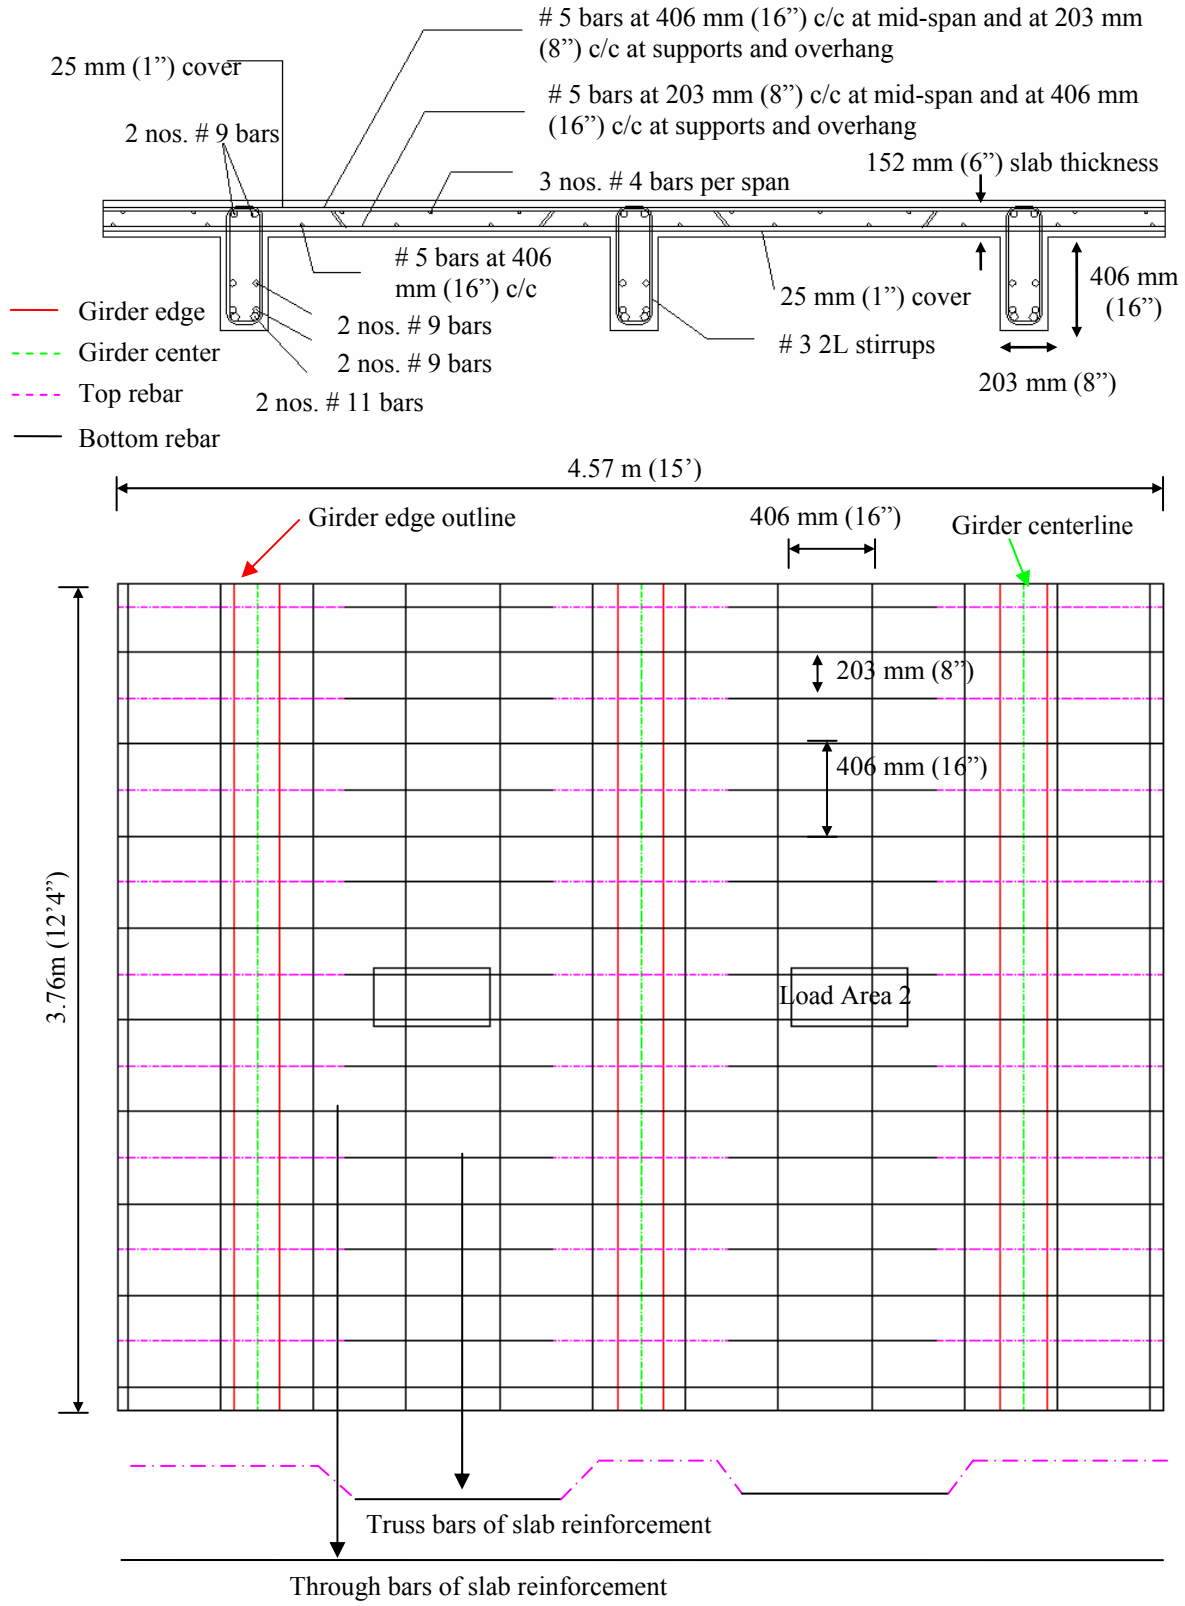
Reinforcement details (Cross-section and plan view) of the test specimen
